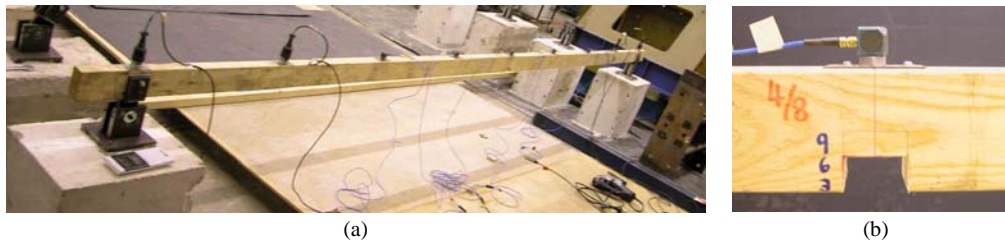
(a) Experimental test set up and (b) medium-size damage (27 mm × 45 mm) of timber beam
